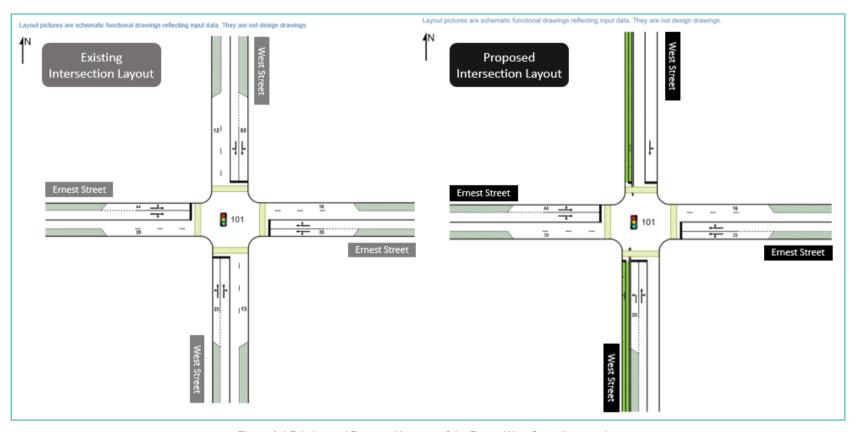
Existing and Proposed Layouts of the Ernest-West Street Intersection
